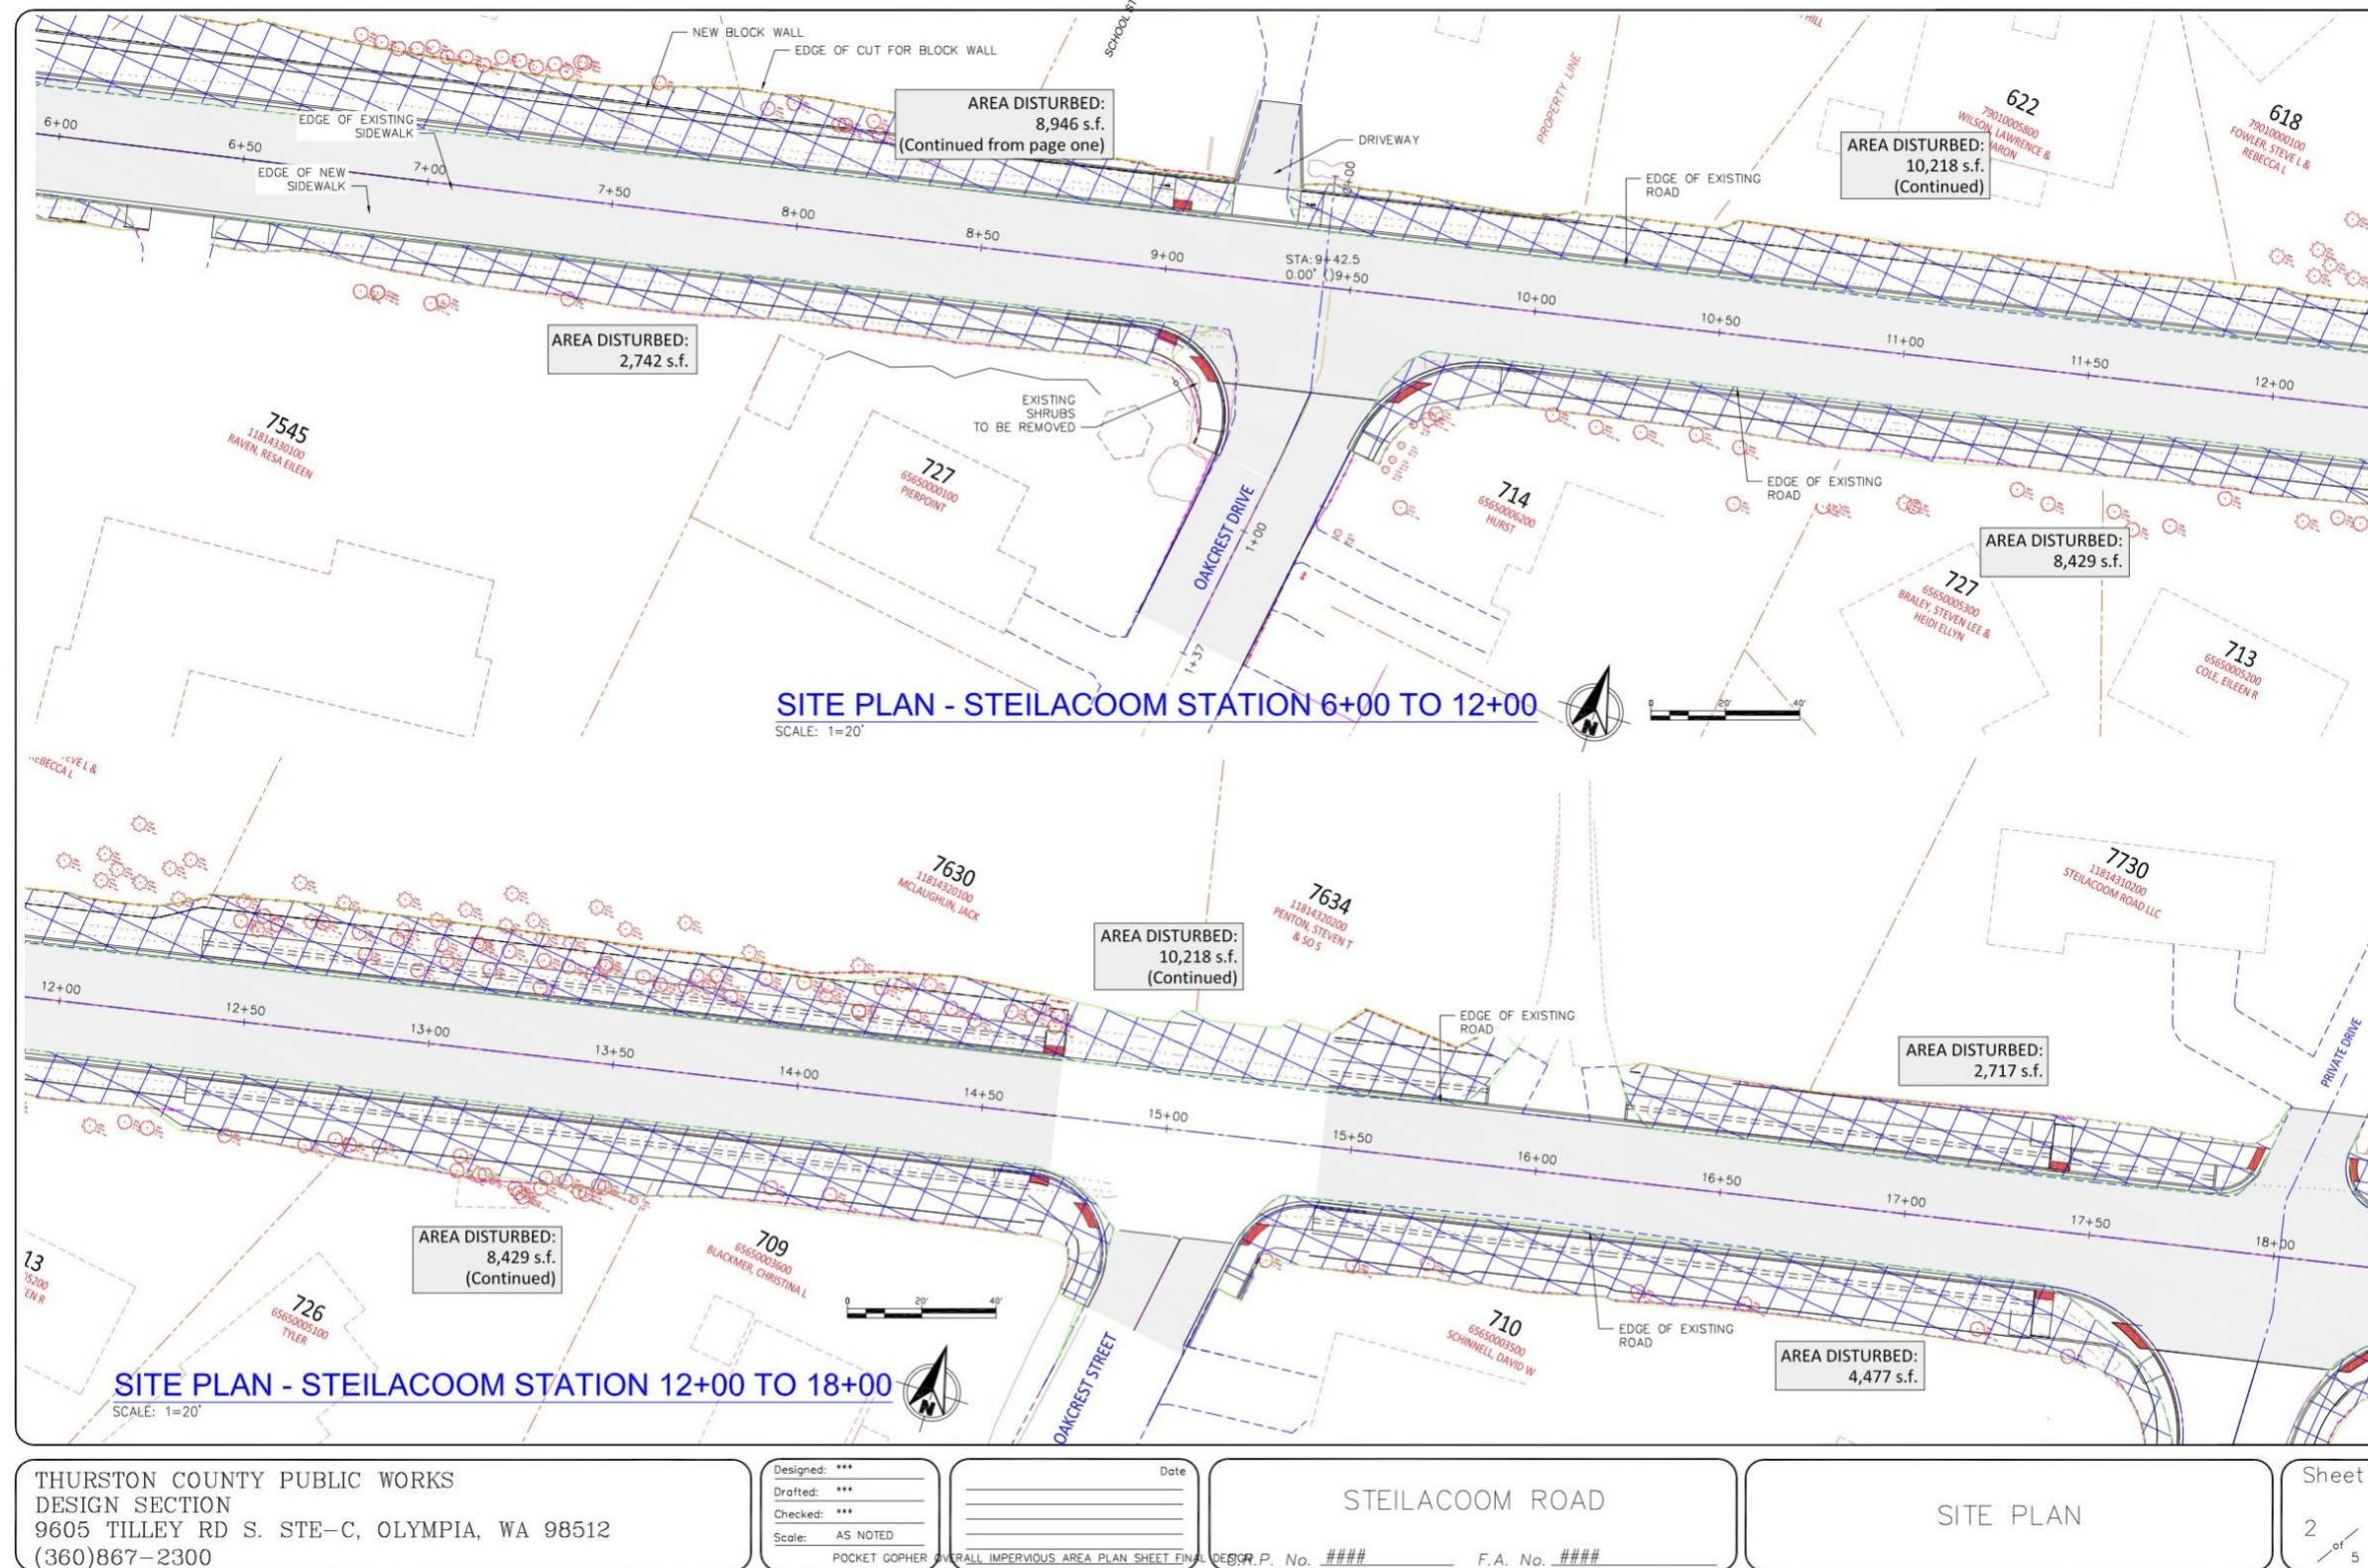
Steilacoom Road Site Plan Drawing – Sheet 2 of 5
